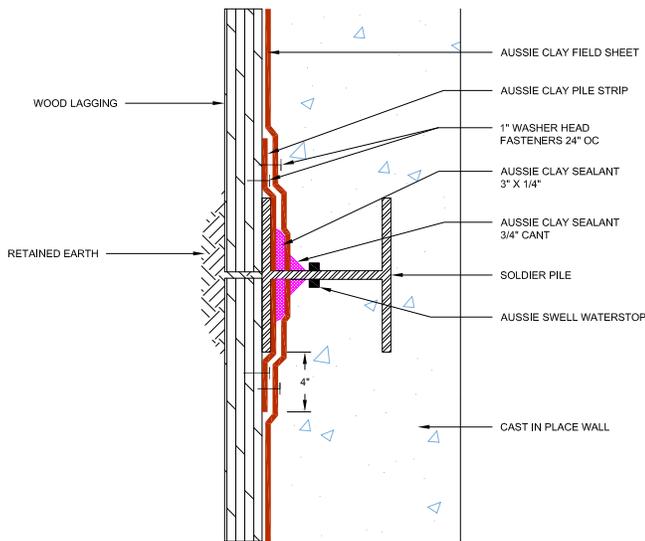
BACK LAGGED SOLDIER PILE
